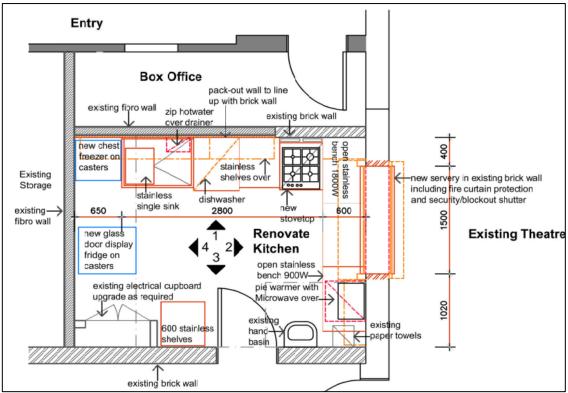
Proposed Floor Plan (Six B Design 2022)
